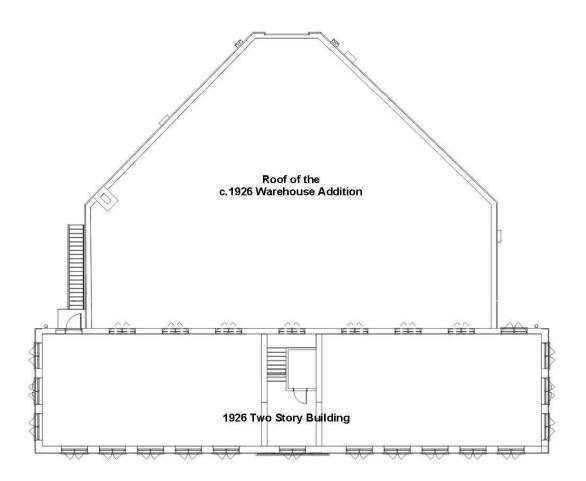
Second floor site plan (Thomas A. Hammer, 2022).
